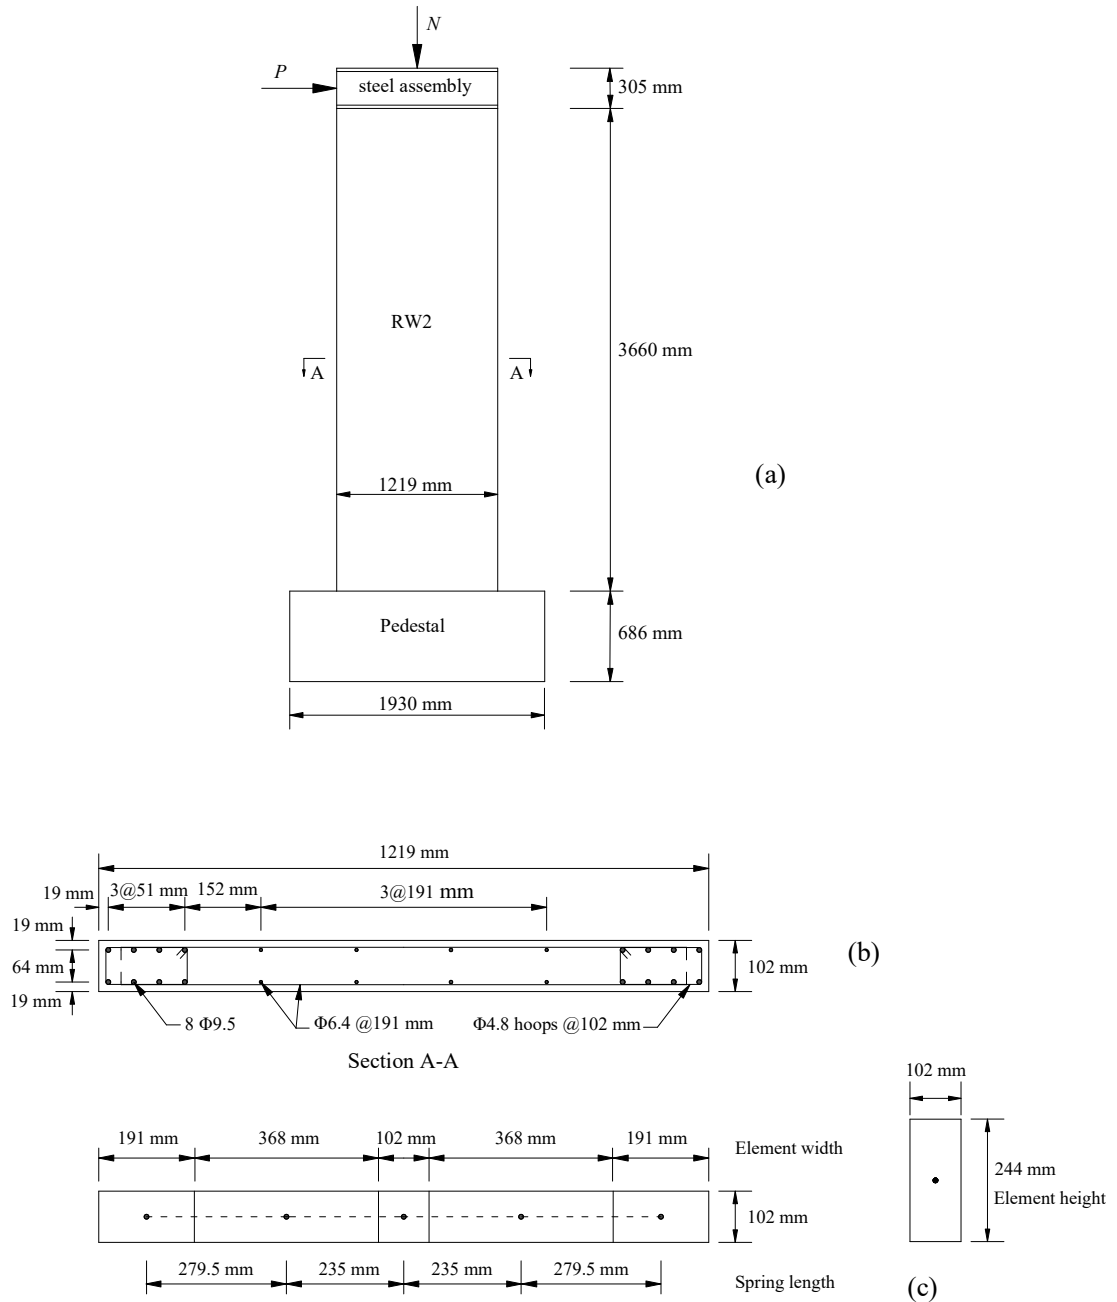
Wall specimen RW2 tested by Thomsen and Wallace (1995)
